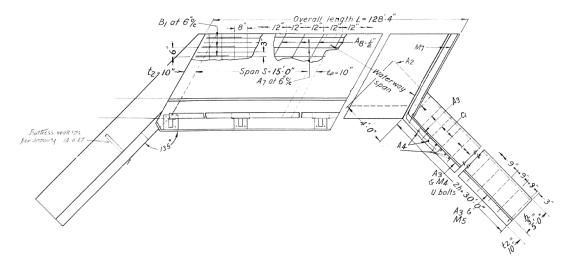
Plan view wing walls (Source: WAE drawings)
